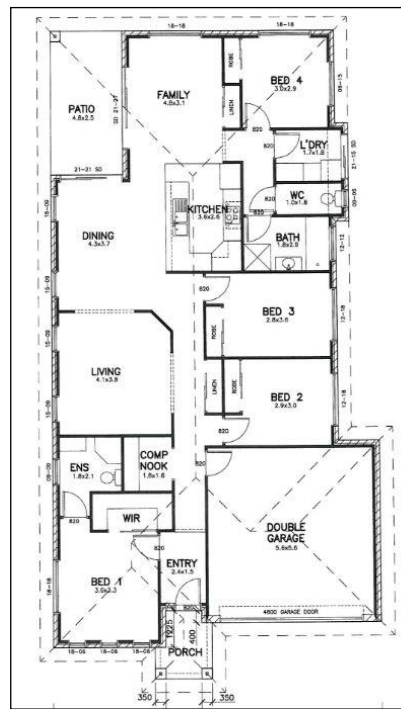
Floor plan of the dwelling on 46 Jacaranda Drive (Source: Council Records)
